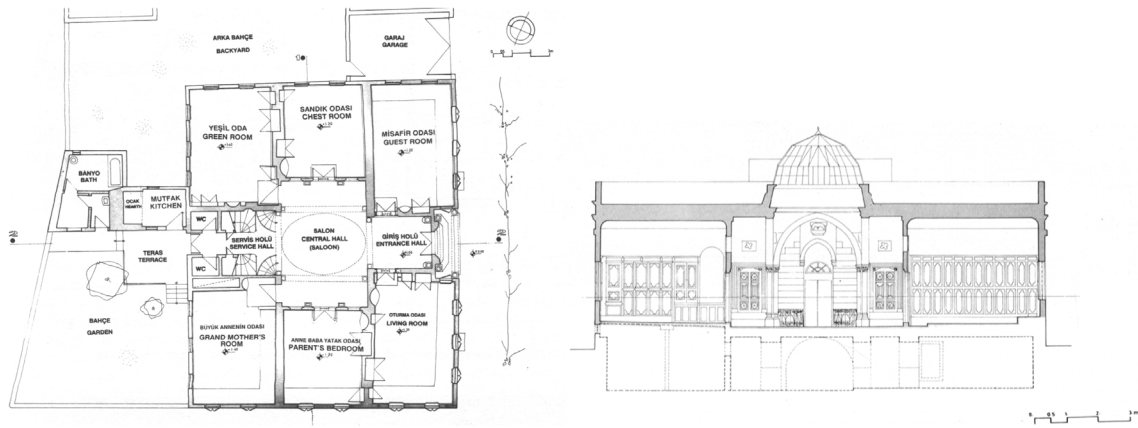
Examples from Traditional Kayseri Houses, ground floor plan and section of İmamoğlu House, late 19th Century, Christian house example (İmamoğlu, 2006).
